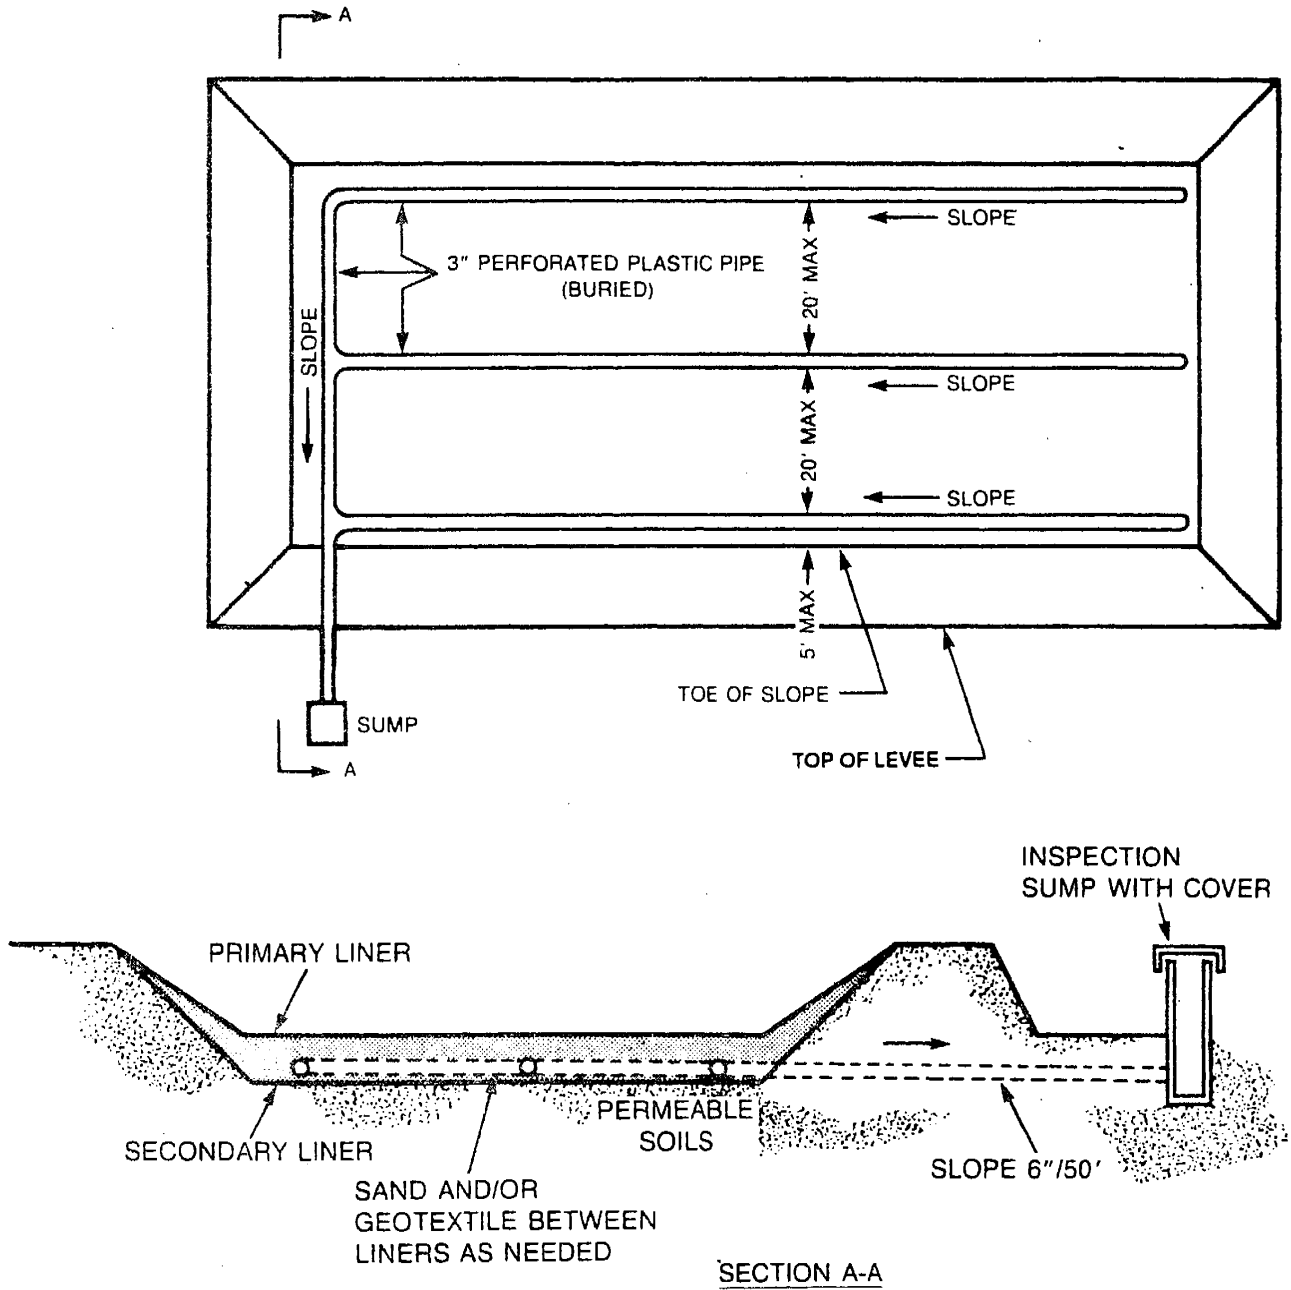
EXAMPLE OF A LEAK DETECTION SYSTEM FOR A LINED PIT CONSTRUCTED IN PERMEABLE SOILS.
